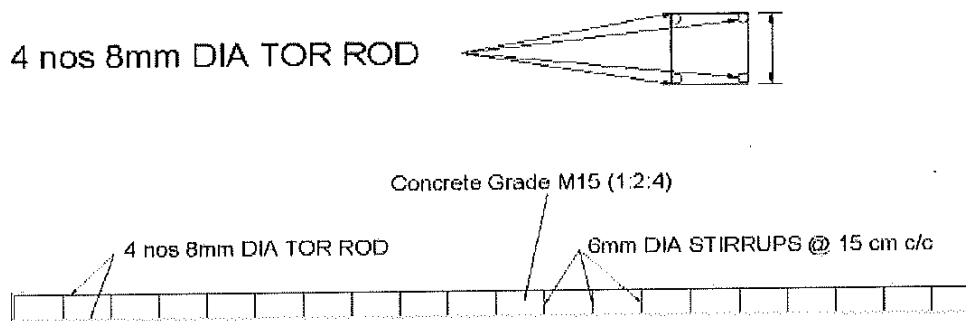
Details of Longitudinal reinforcement of RCC Jack Jetty
